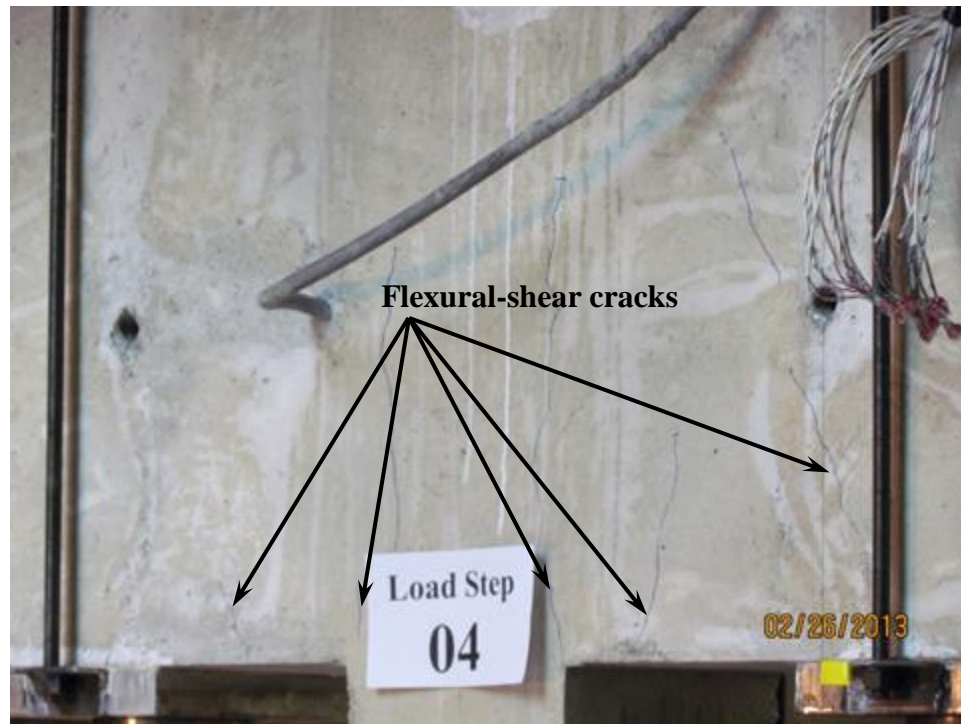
Flexural-shear cracks in top beam of TS02
